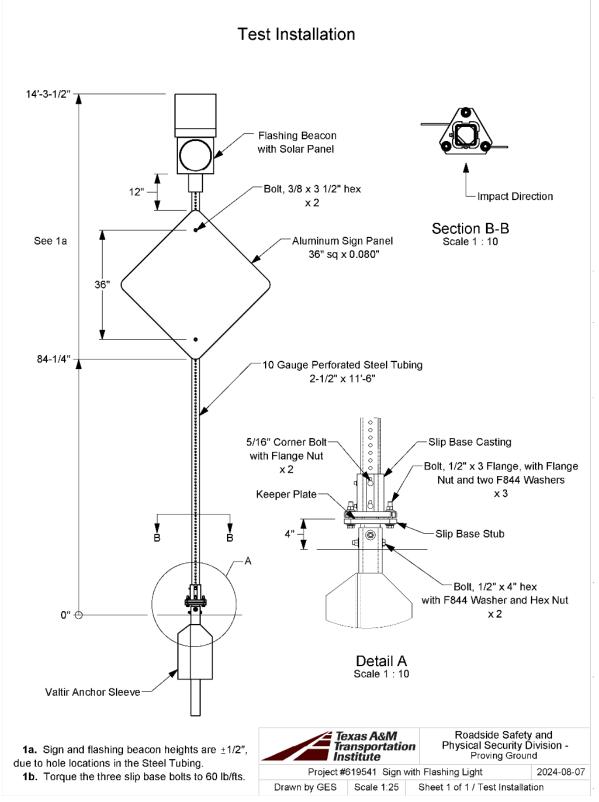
Details of the Breakaway Sign Support System with Flashing Equipment.
